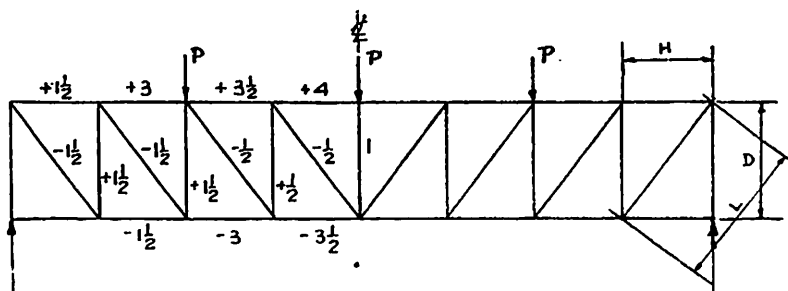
Coefficients for roof girder with trusses at alternate panel points.
